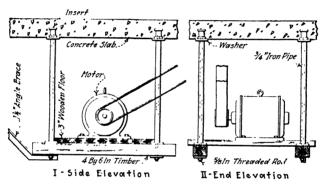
Platform suspended by 4 rods and 4 pipes from concrete ceiling provided with inserts. A belted motor as above should have a base or slide rails under it (Sec. 53).
